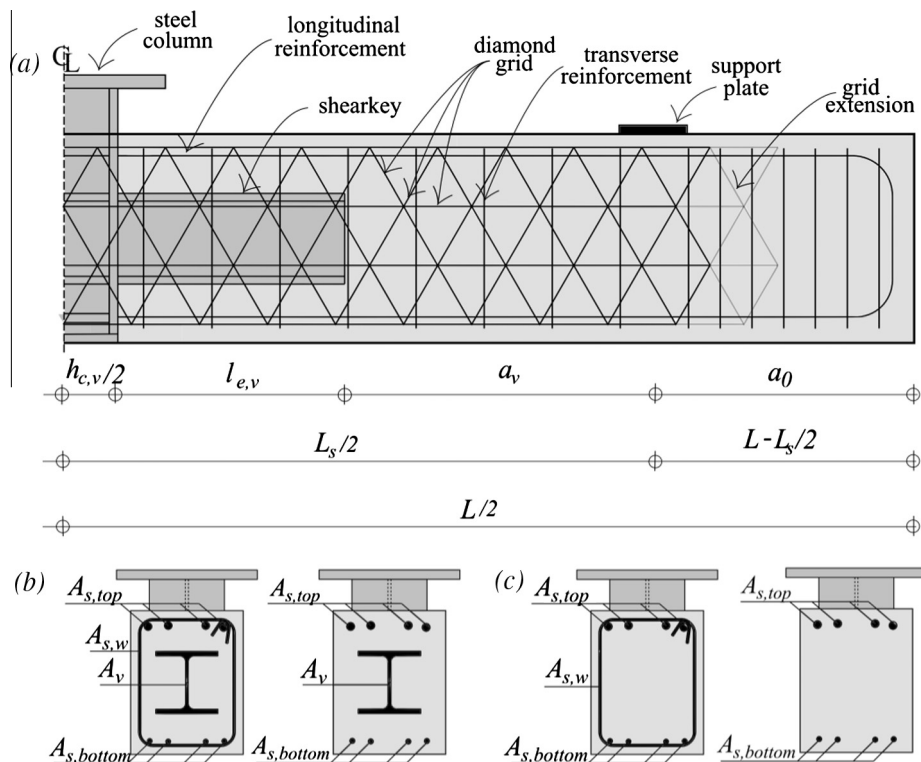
Geometrical configuration, reinforcement layout and measurement system: (a) elevation view; cross sectional views within (b) composite and (c) non-composite sections for specimens with stirrups specimens without stirrups.
